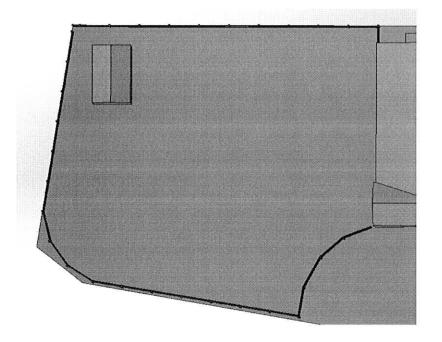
Overhead view of the proposed fence layout. The curved sections at the southwest and southeast corners are visible, along with the fence's termination at the southwest corner of the home's side entry. The base outline follows the existing aluminum fence alignment near the property line.
